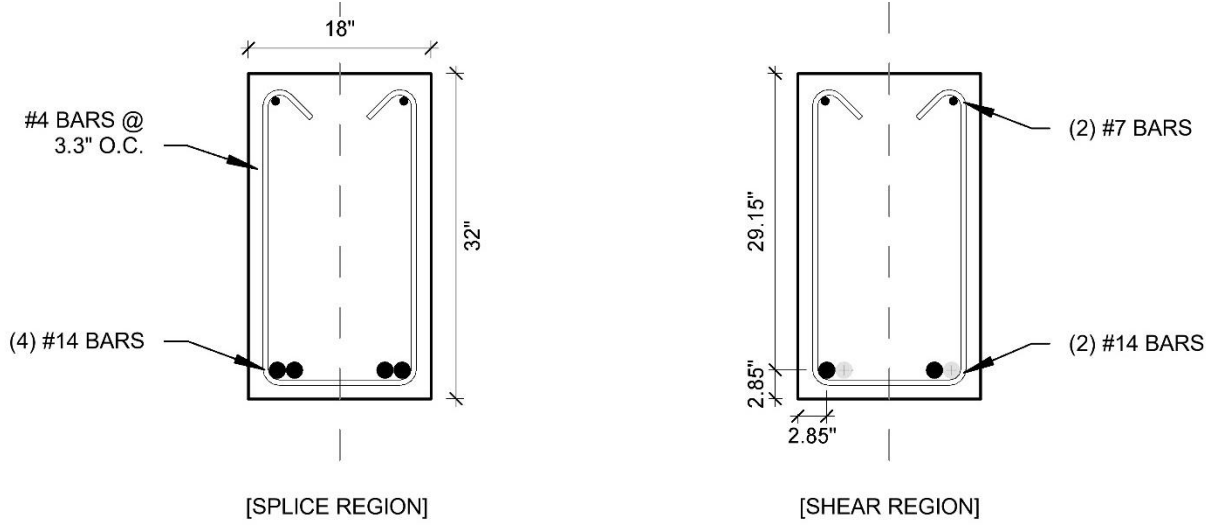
Cross section of 14-g (1 in. = 25.4 mm)
